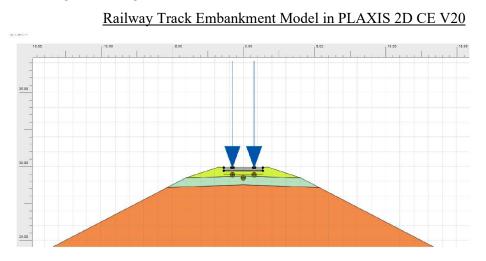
Geometrical arrangement of Wheel load on Sleeper Ballast Blank Assembly.
